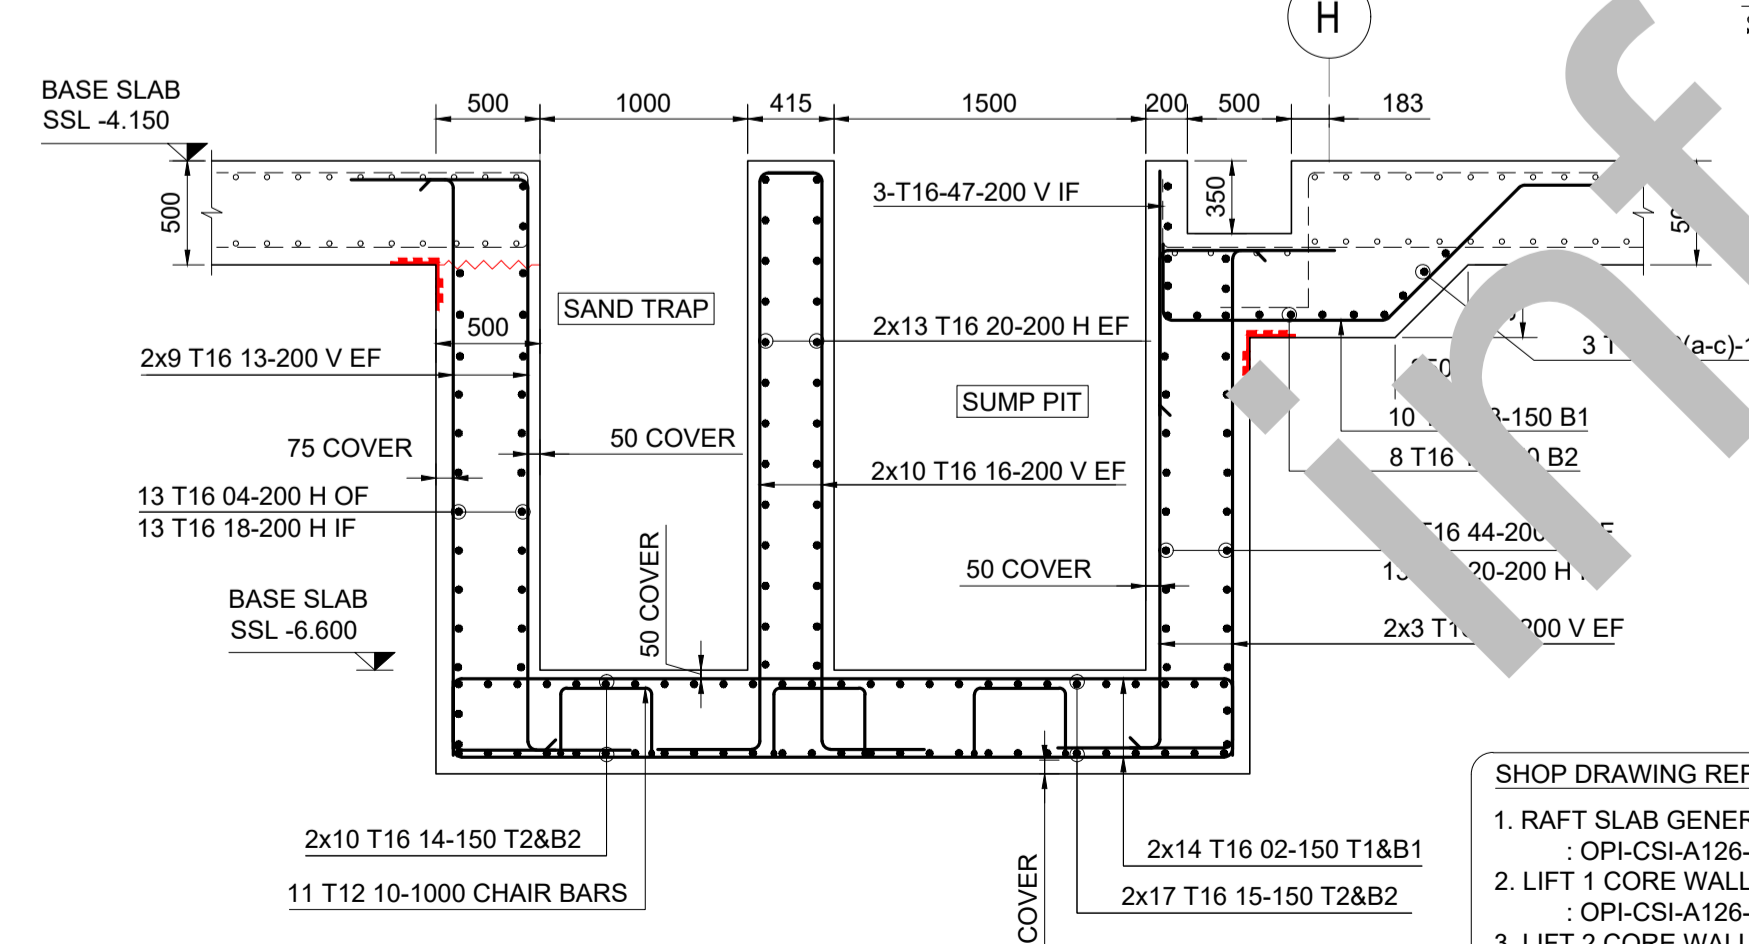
DETAIL-B SUMP PIT SAND TRAP WALL REINFORCEMENT DETAILS
